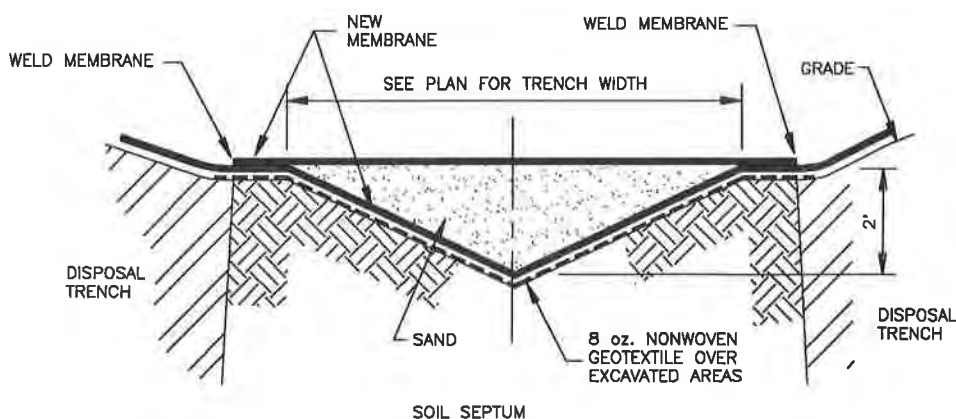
Vee-shaped Wind Uplift Anchor Trench Detail
